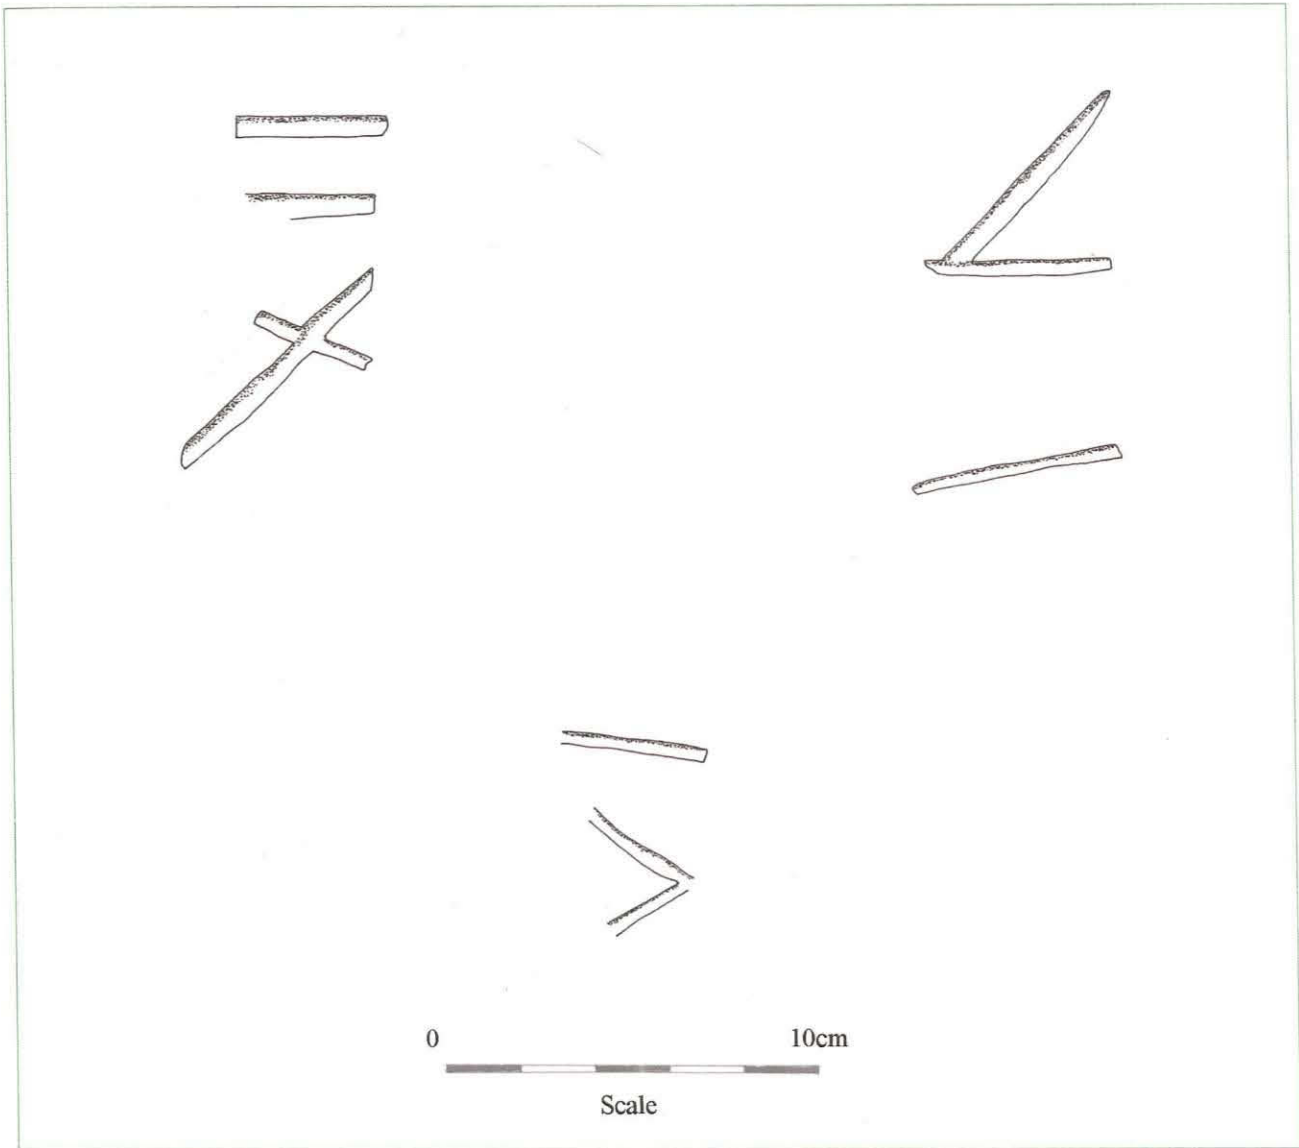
Three carpenters marks found on original beams within the roof of the schoolhouse. At scale 1:2.
